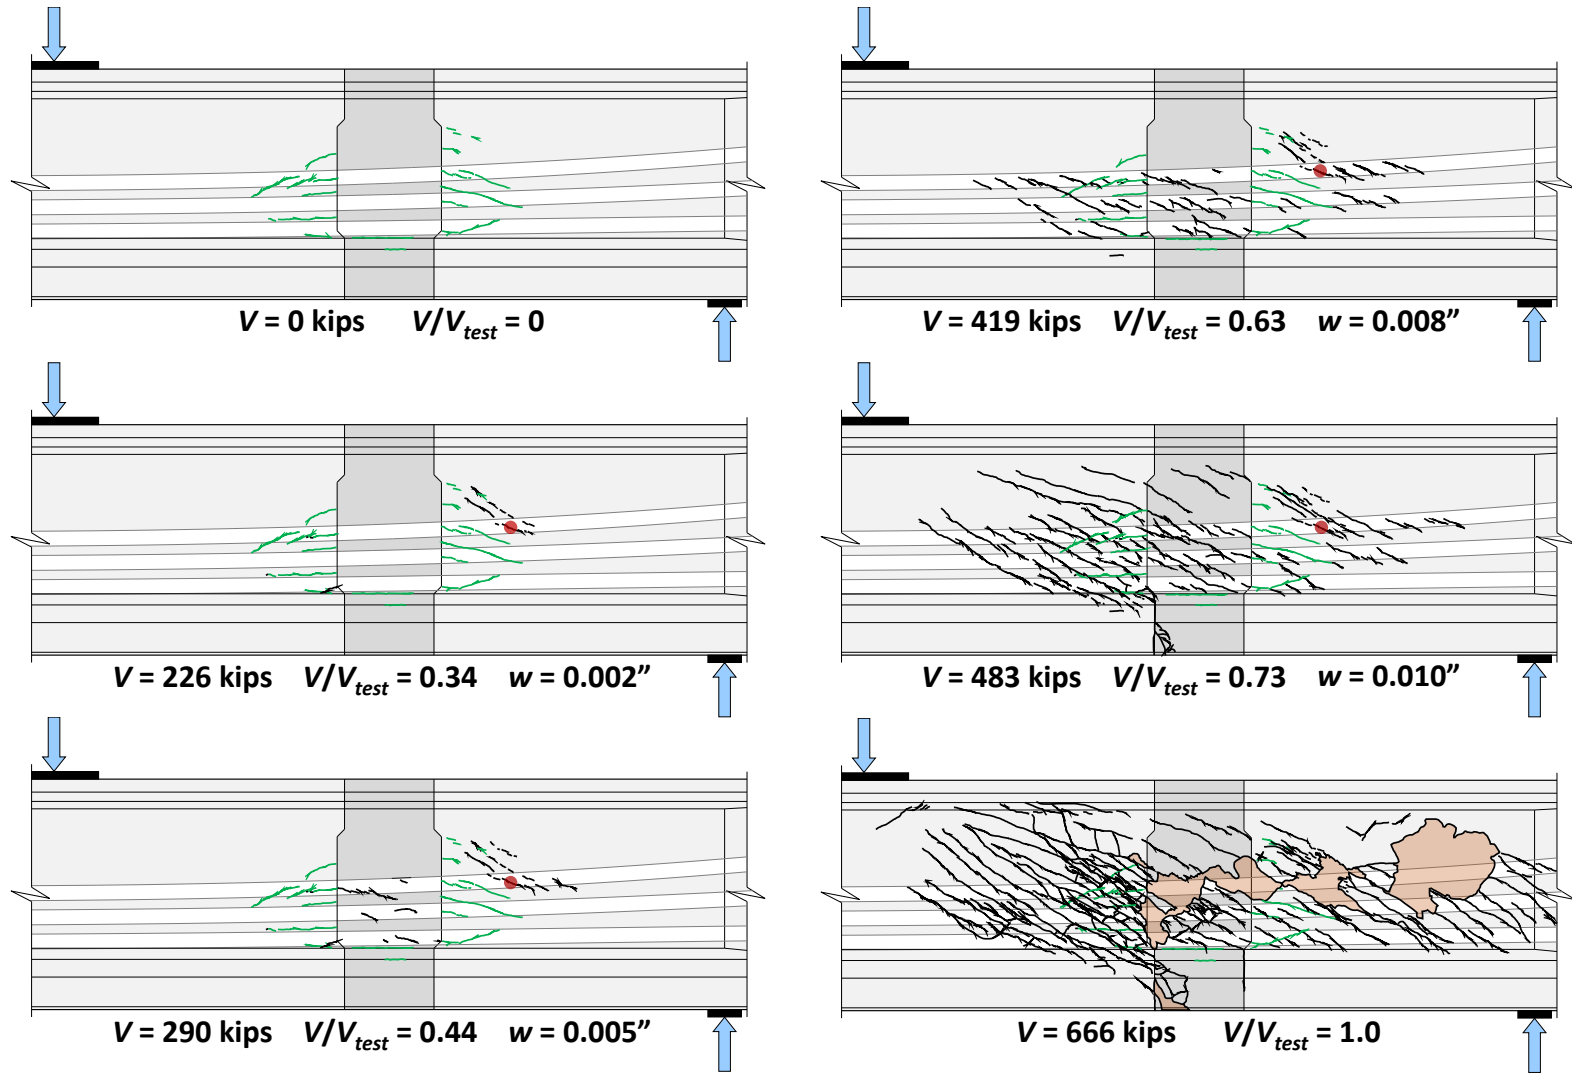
Summary of cracking behavior - Test Girder 1
